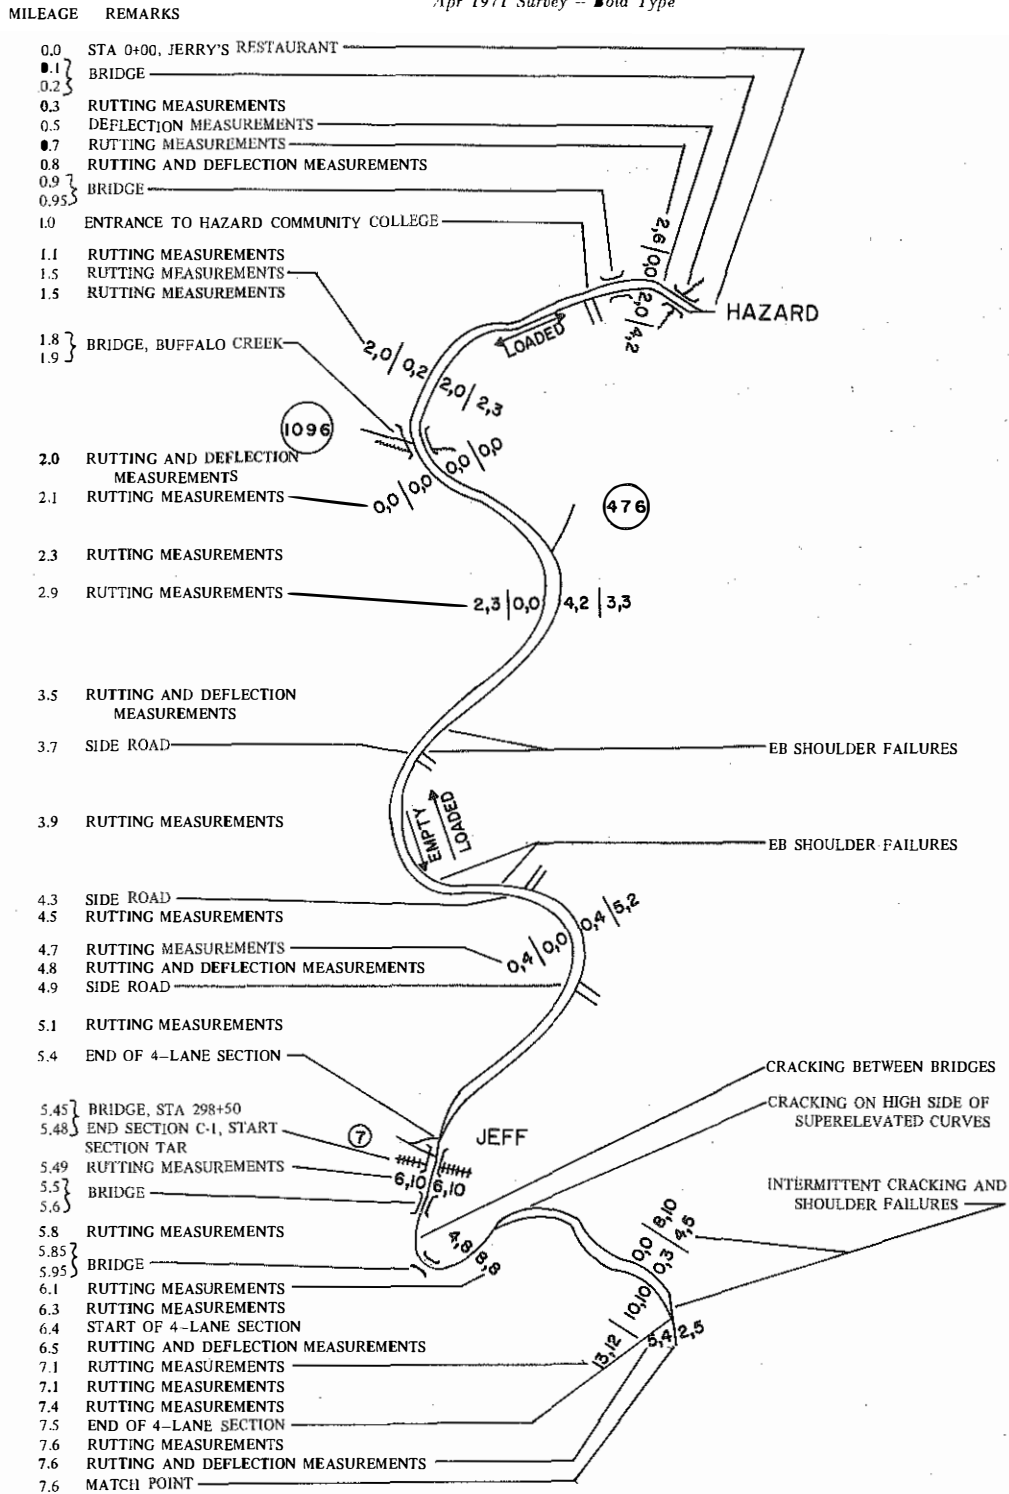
Sketch of Pavement Defects on Sections C-1 and TAR - Hazard to Sassafas.
